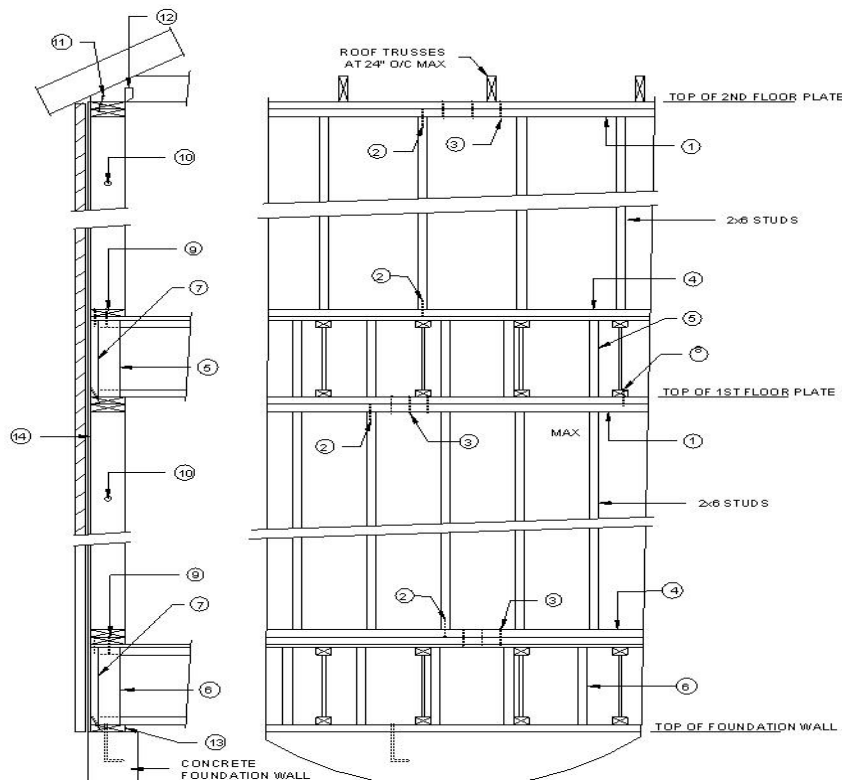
Stud wall construction for the product (wall elevation, interior face)
